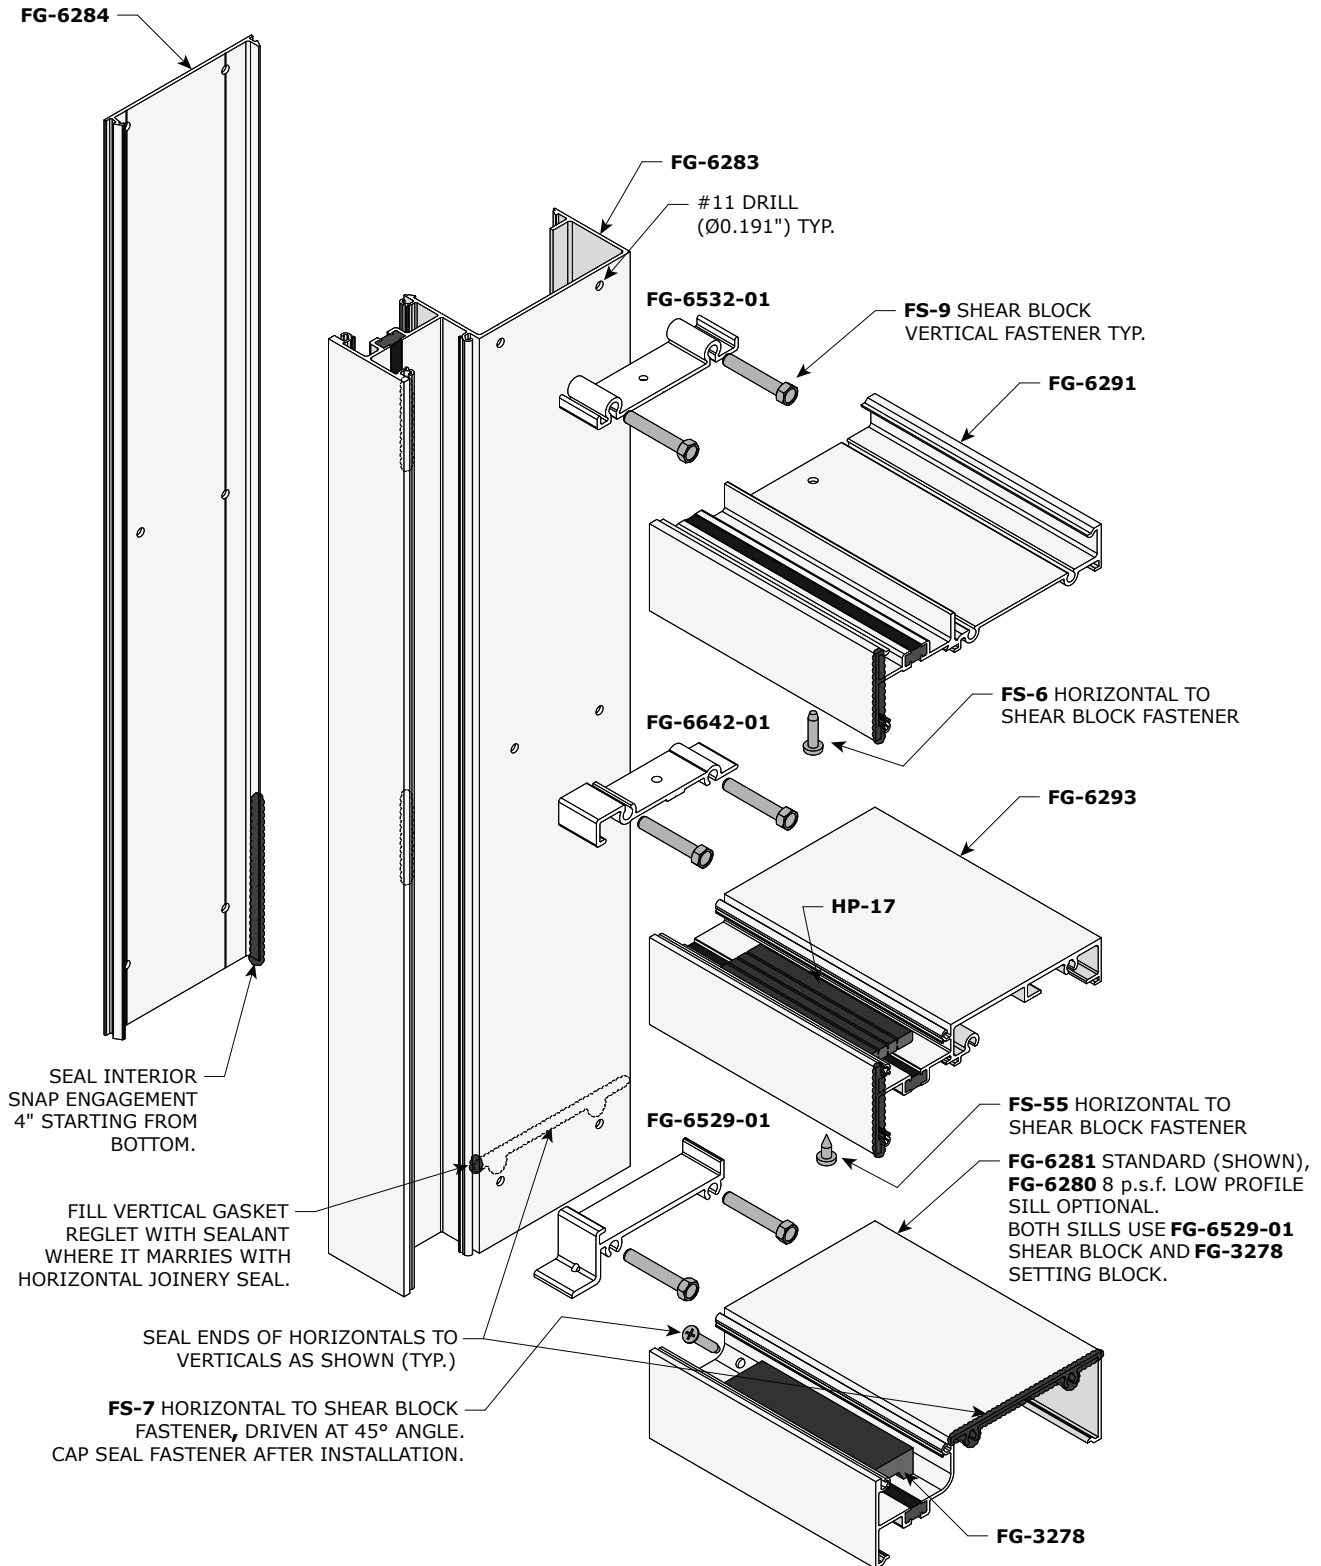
Frame Assembly - Front Set, Inside Glazed, Shear Block System
